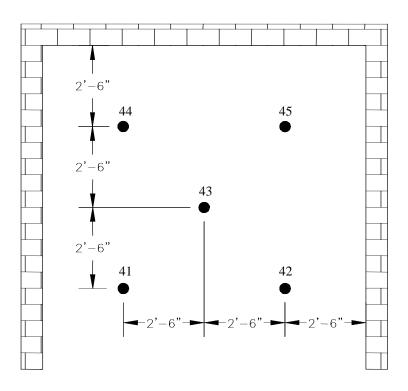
Instrumentation Arrangement--Part III (Burn Roof Ceiling).
